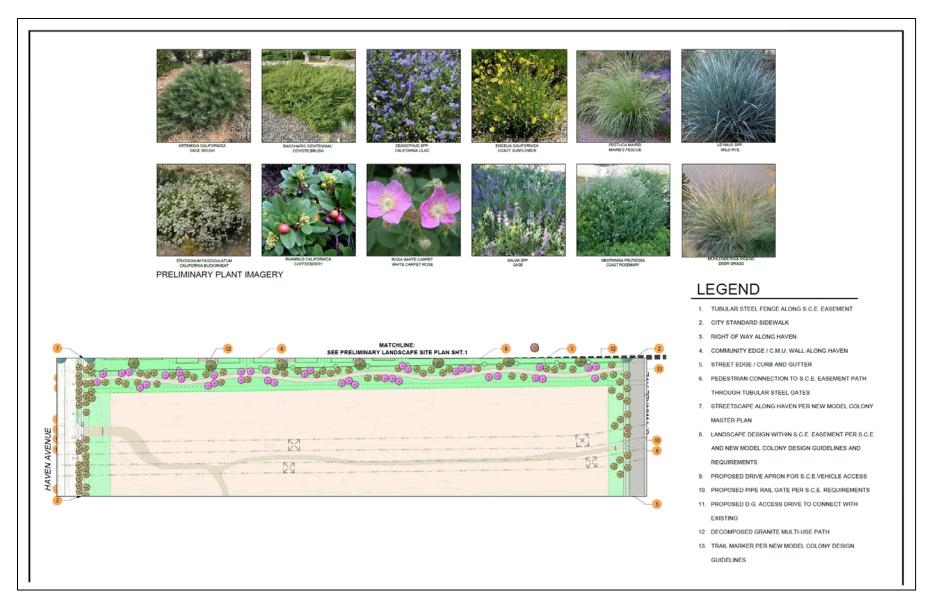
LANDSCAPE PLAN – CENTRAL PARK
